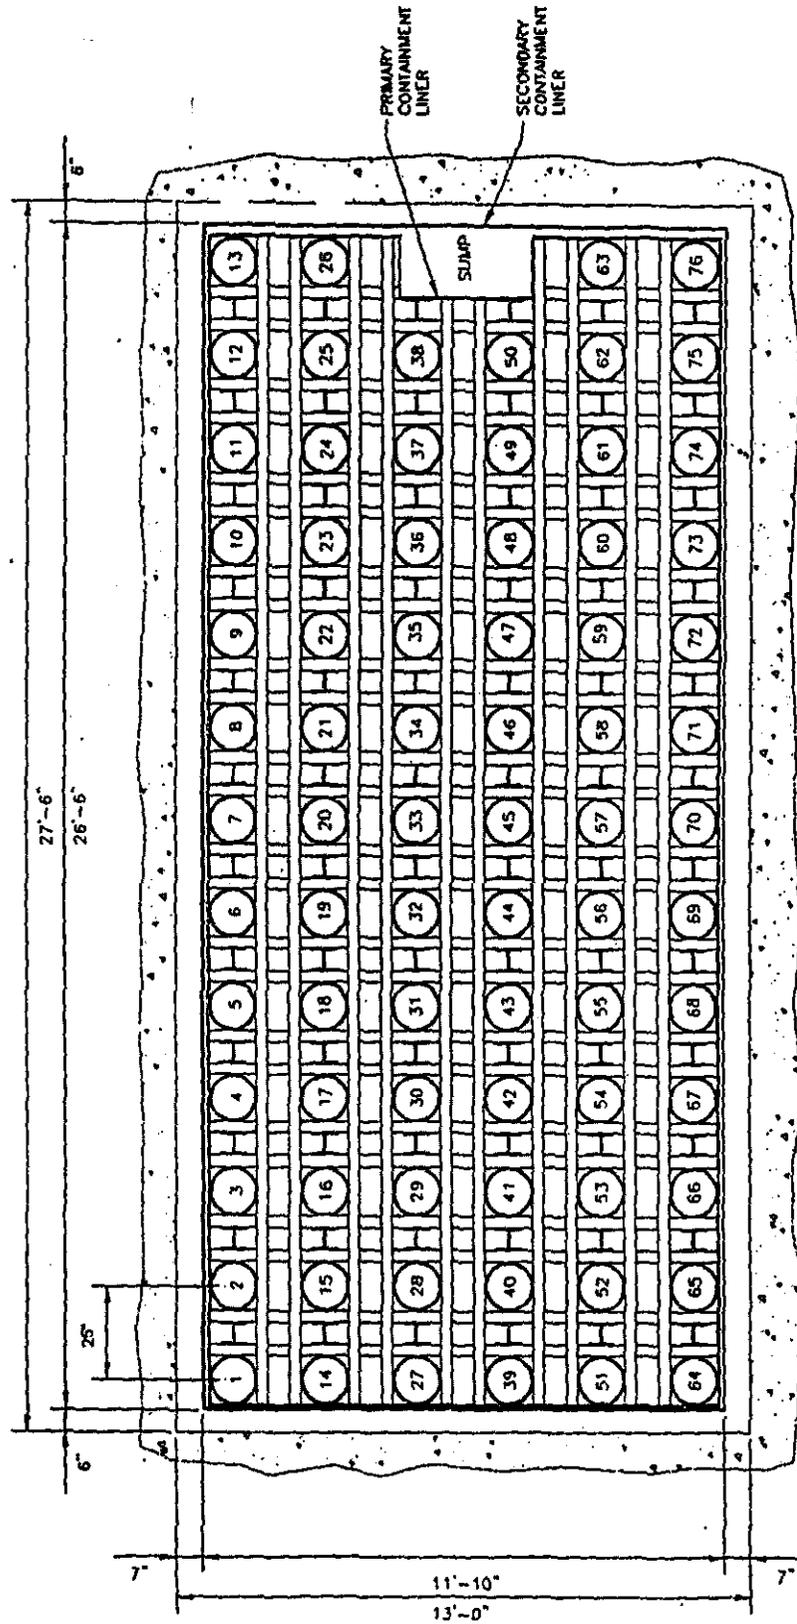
Typical Arrangement Type 2 Containers in Container Storage Rack for Pool (Top View).
